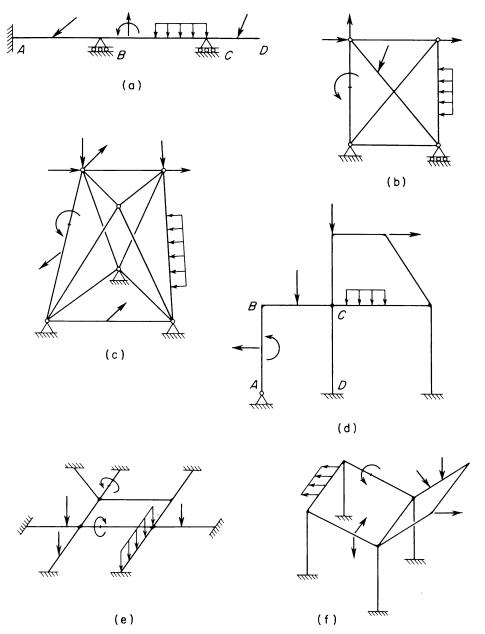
Types of framed structures: (a) beam, (b) plane truss, (c) space truss, (d) plane frame, (e) grid, and (f) space frame.
